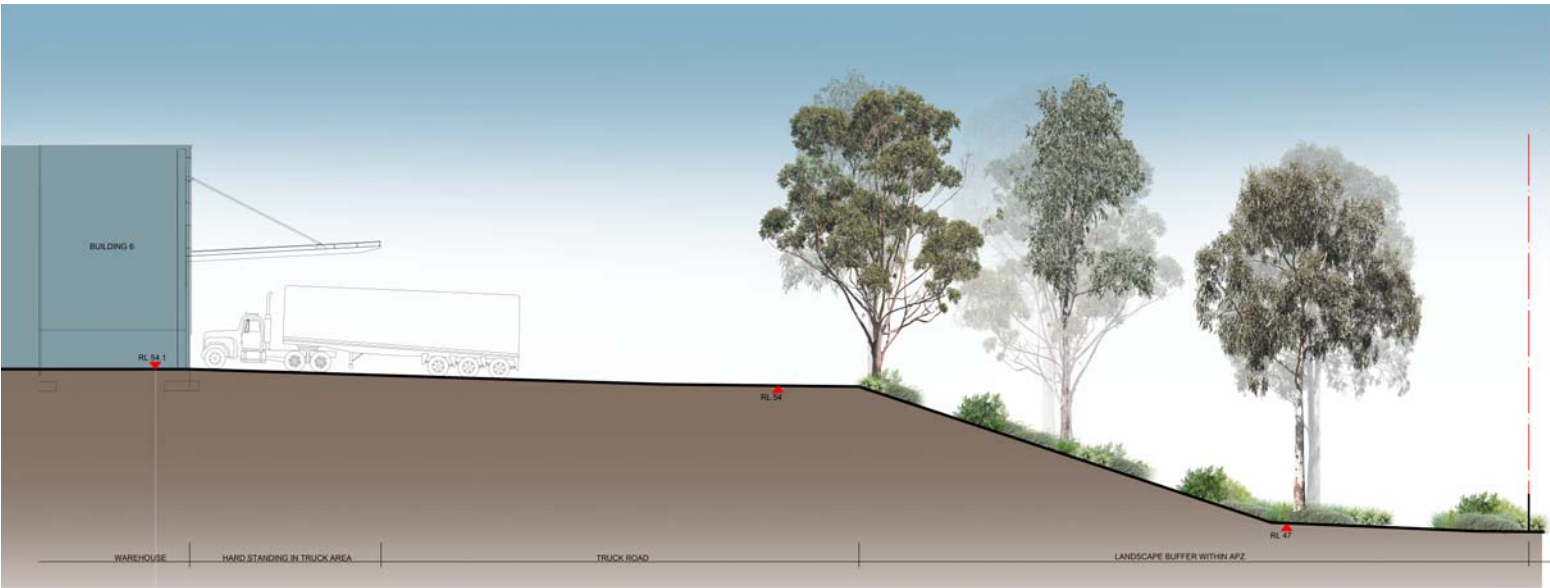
SECTION THROUGH EAST BOUNDARY (BUILDING 6)
